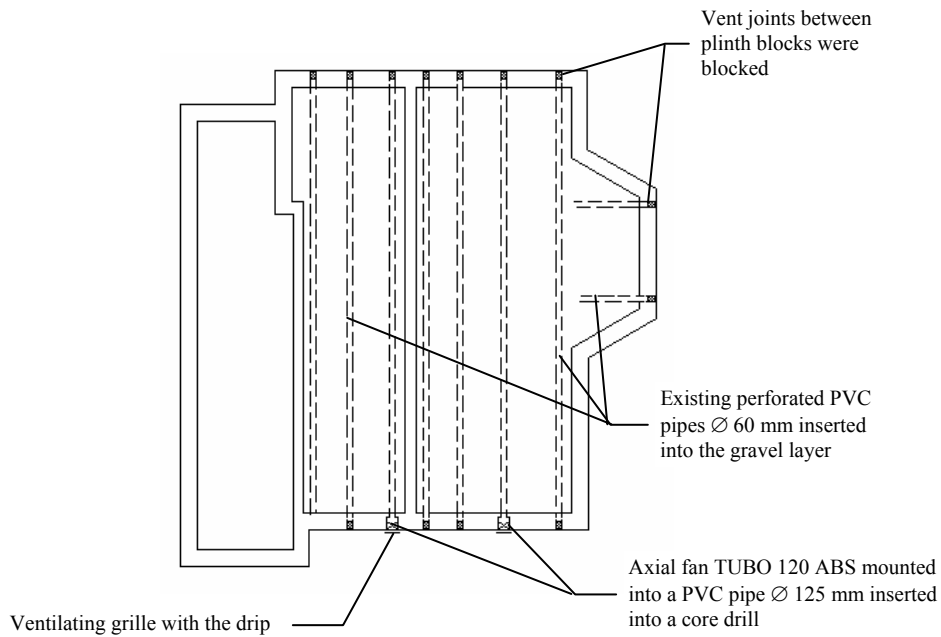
Plan of foundations, layout of perforated pipes and location of fans
